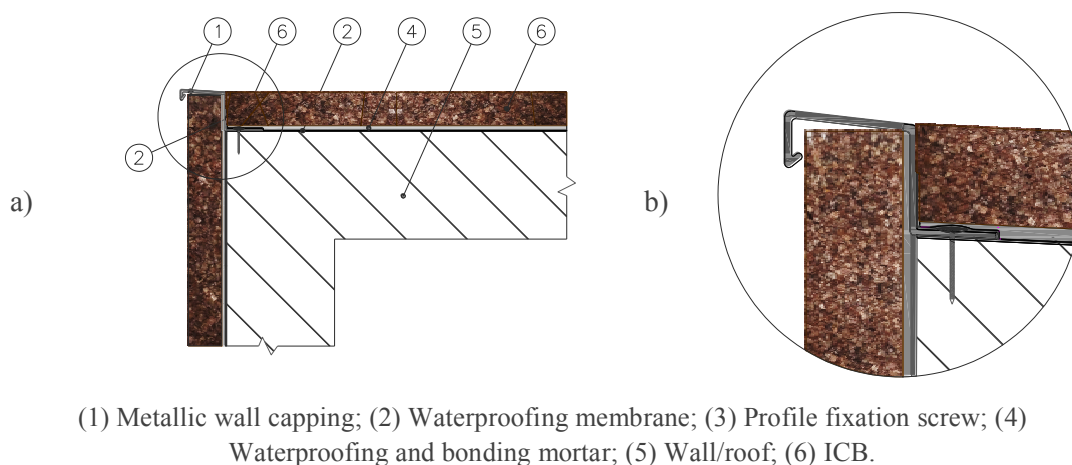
Connection facade/flat roof: a) General view; b) Detail of the wall capping application.
